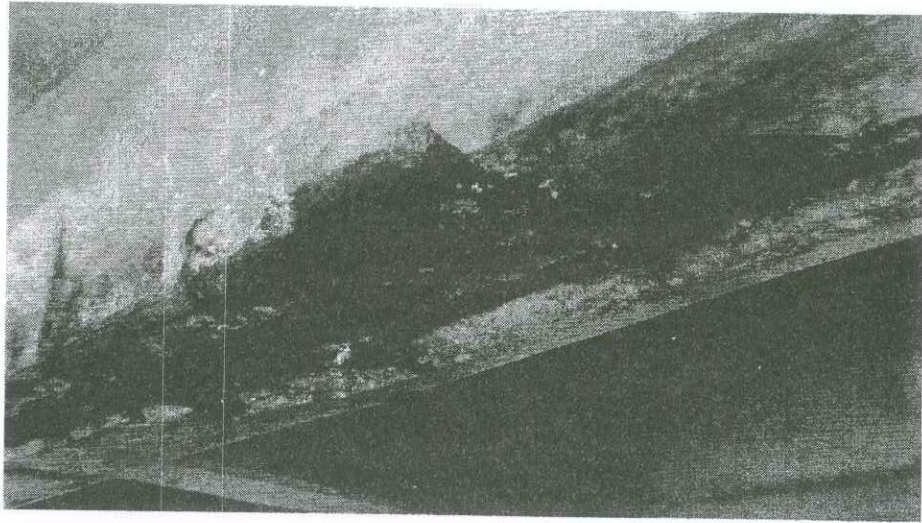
Corroded reinforced concrete beam of a highway bridge
